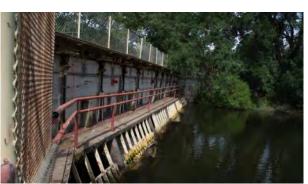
Canal upstream of existing bridge/weir (facing west).
